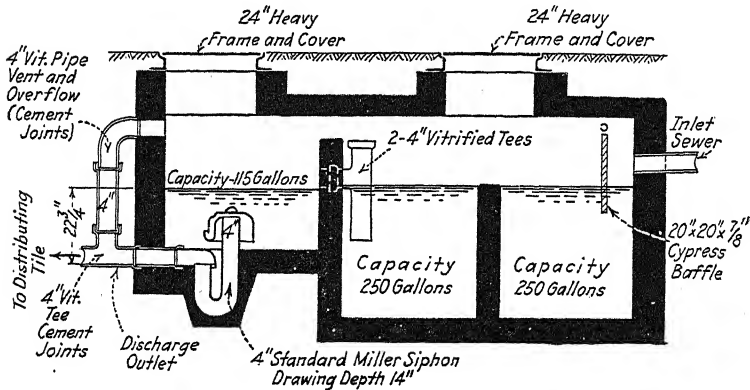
Settling tank and dosing tank for subsurface irrigation system.
